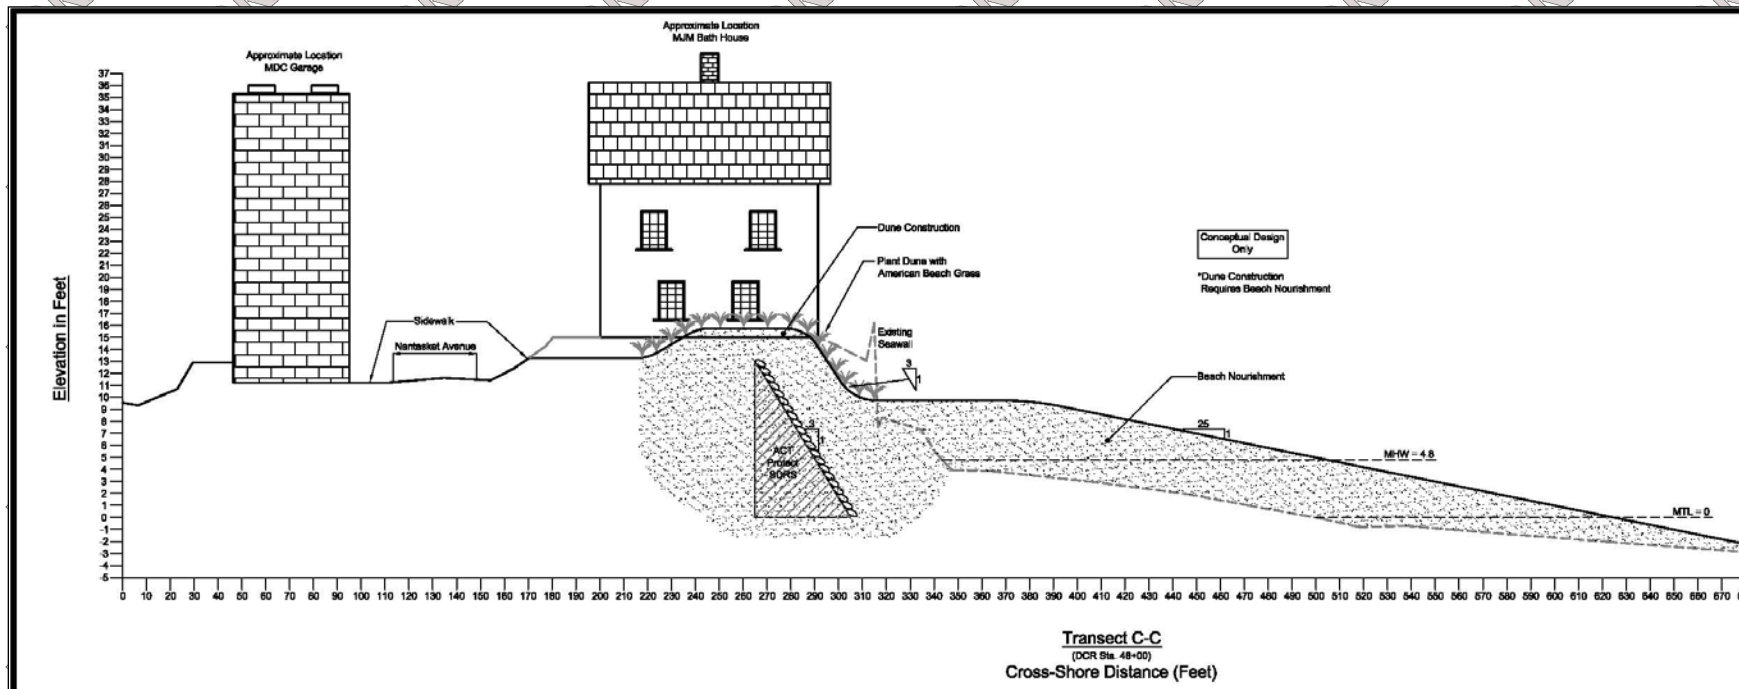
Conceptual layout of Alternative 8 and impact on the MJM bathhouse (conceptual layout only, not to scale).
